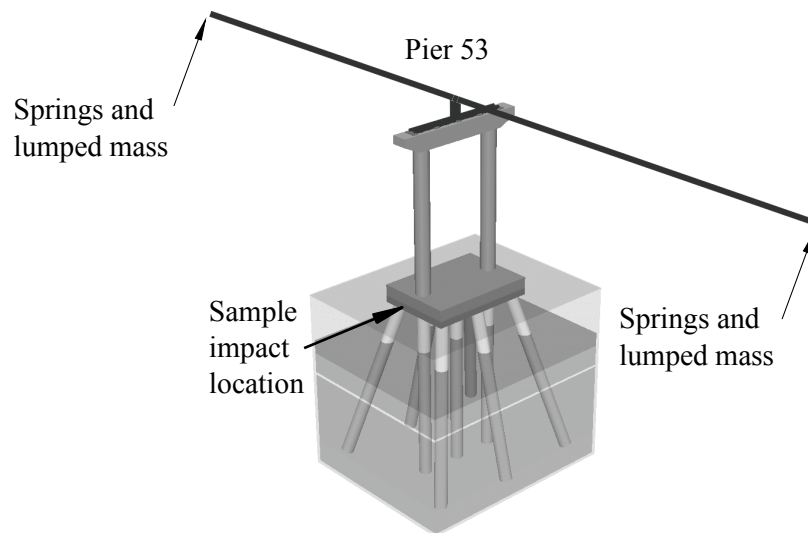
New St. George Island Bridge Pier 53 OPTS model
